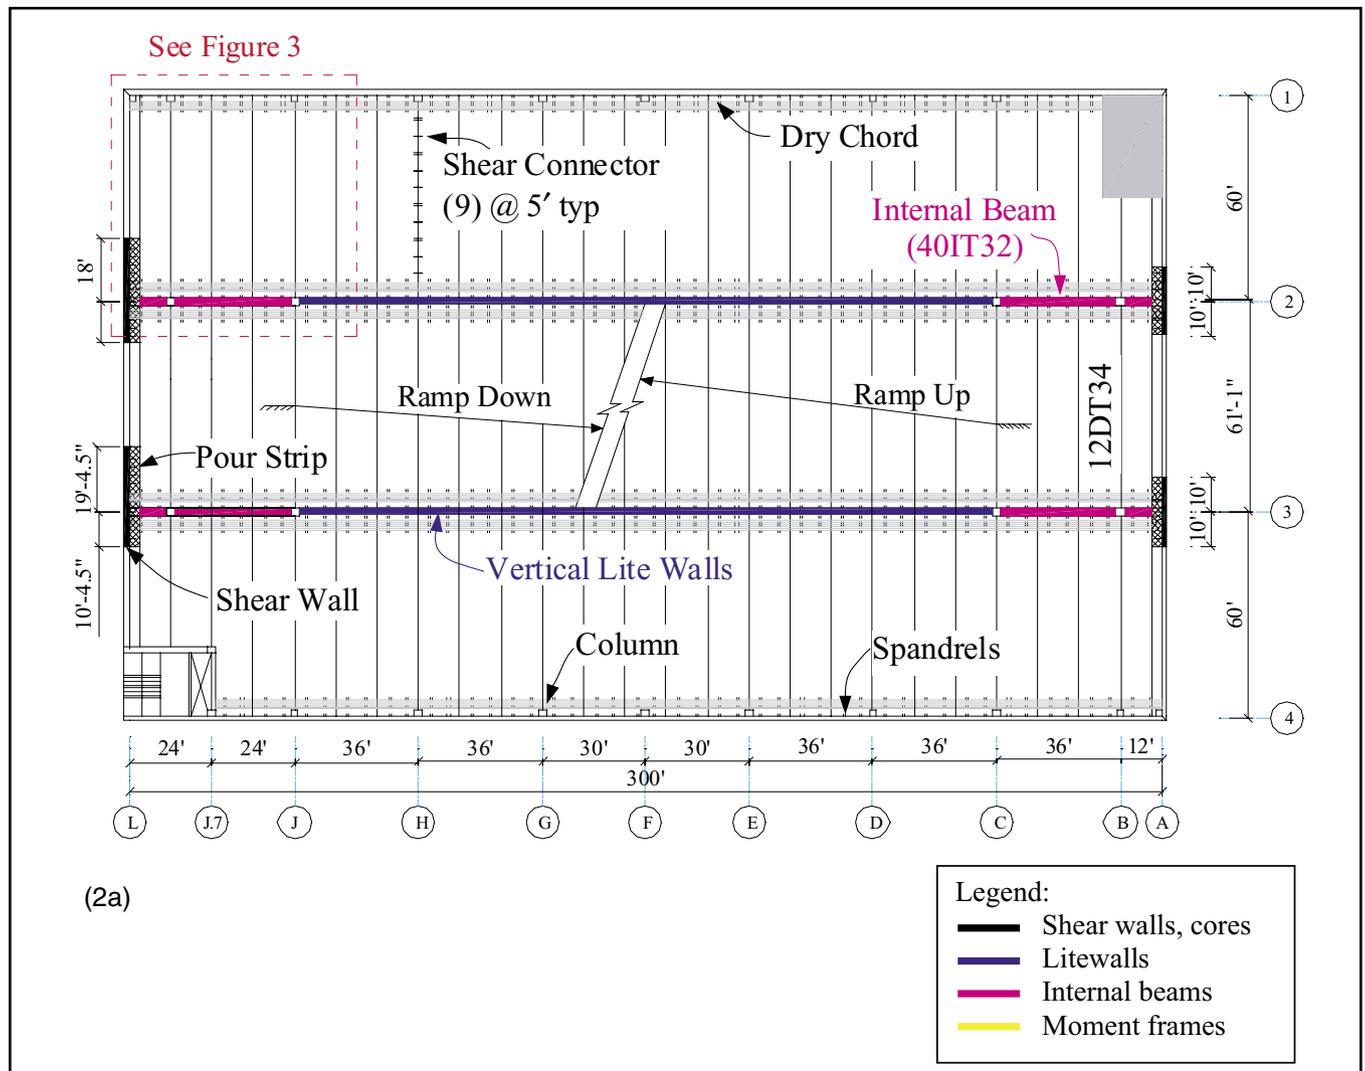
Prototype structures (2a): Plan of PS#1: Side-by-side parking structure, four stories. Note: 1 ft = 0.308 m; 1 in. = 25.4 mm.
